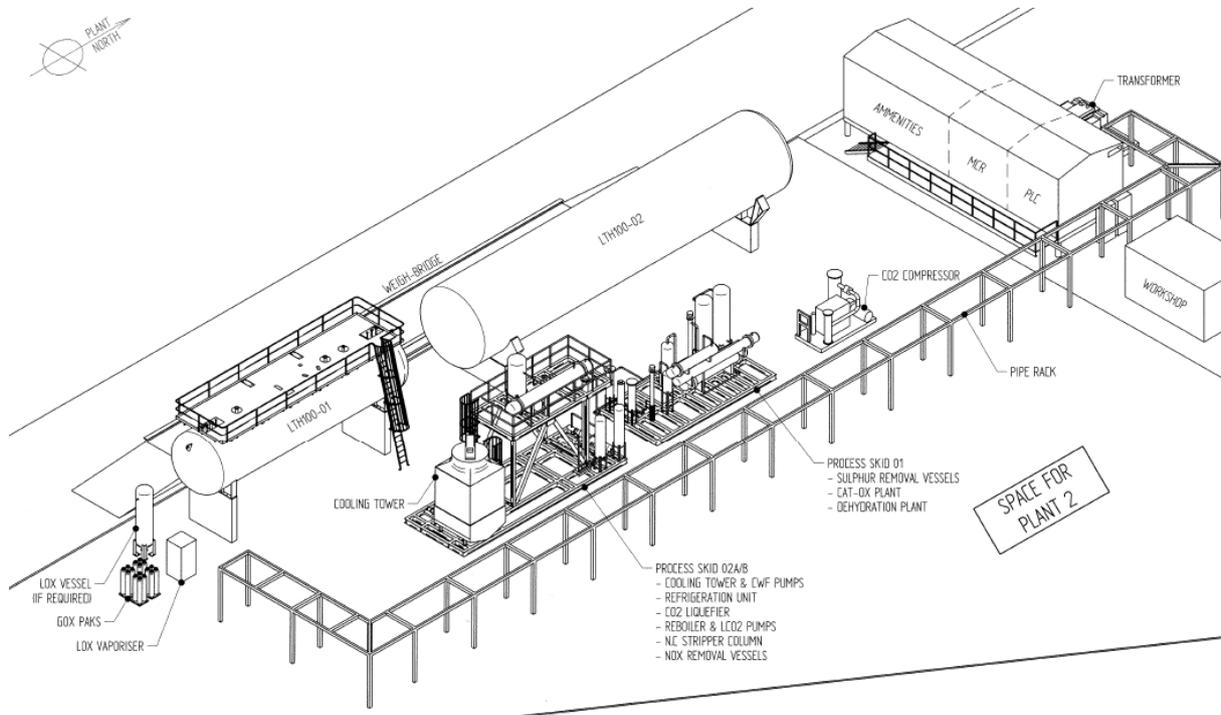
Proposed Plant Layout – Supagas 220 Bolong Road, Bomaderry, NSW (source: Supagas Pty Ltd GLPP16027-L1-008)
